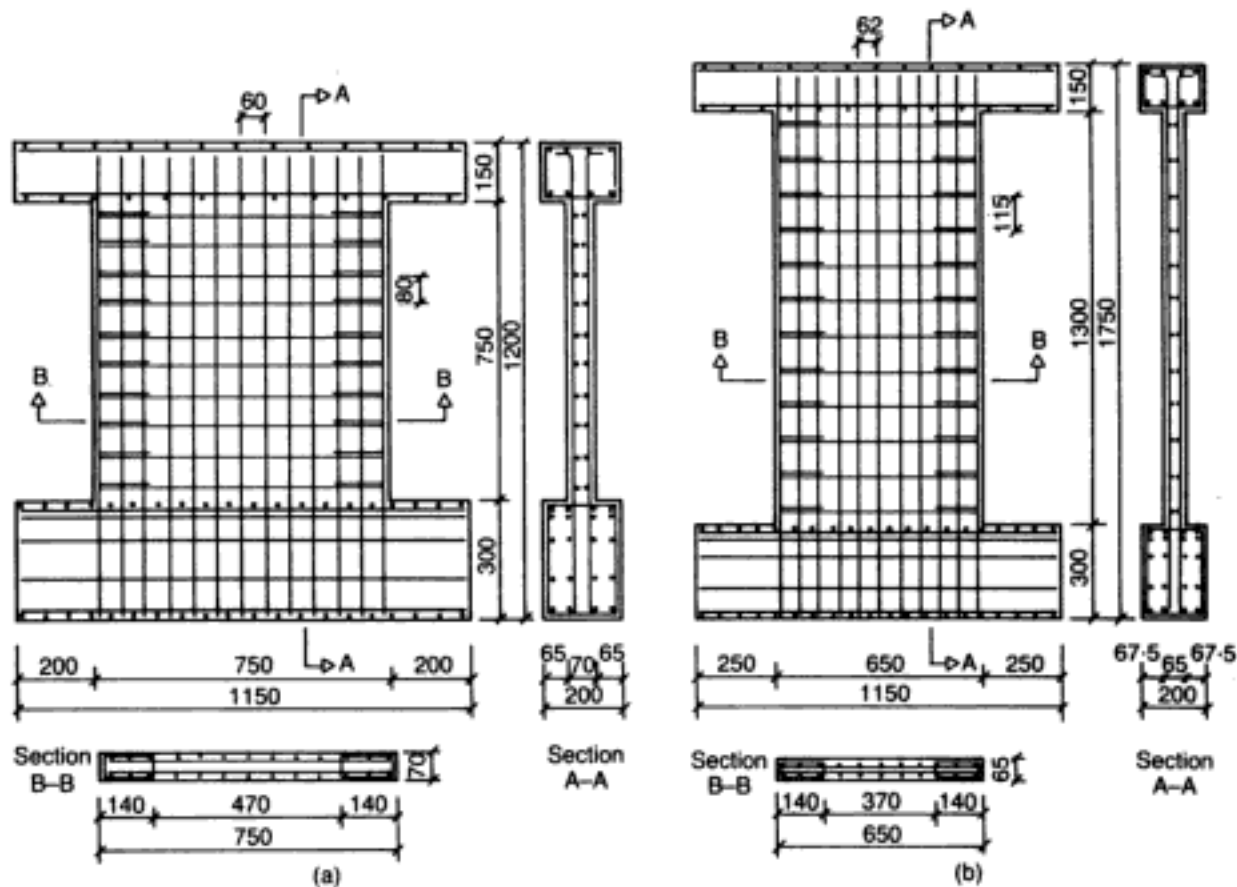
Geometry and reinforcement details for thirteen walls consisting of two specimen types:¹²⁸
